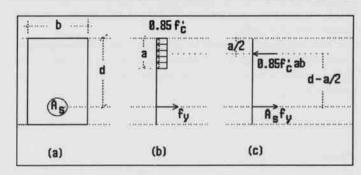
Reinforced Concrete Beam: (a) Dimensions, (b) Stresses, and (c) Forces.
